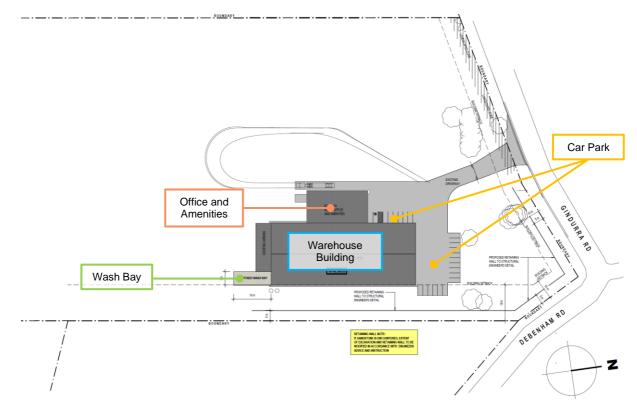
| DA 52541/2017 (Mod 2) Approved Plan
